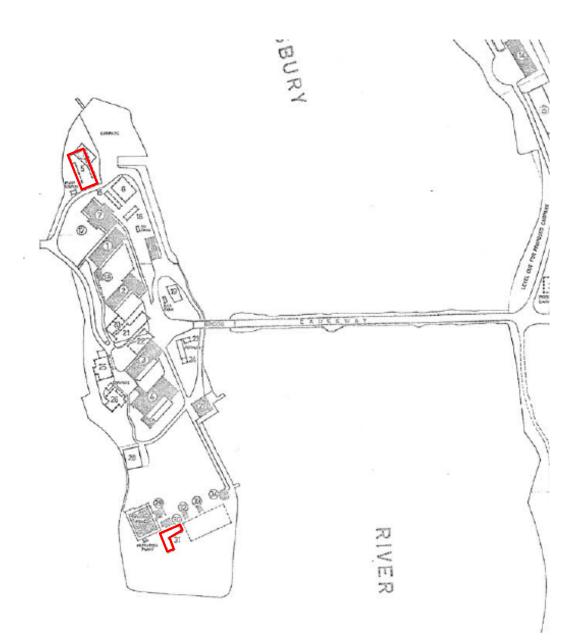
Detail from proposed site plan, Peat Island, 1974. The subject structures are marked in red. Source: Plan Services, NSW Finance Services & Innovation– MH6/187 5.1
